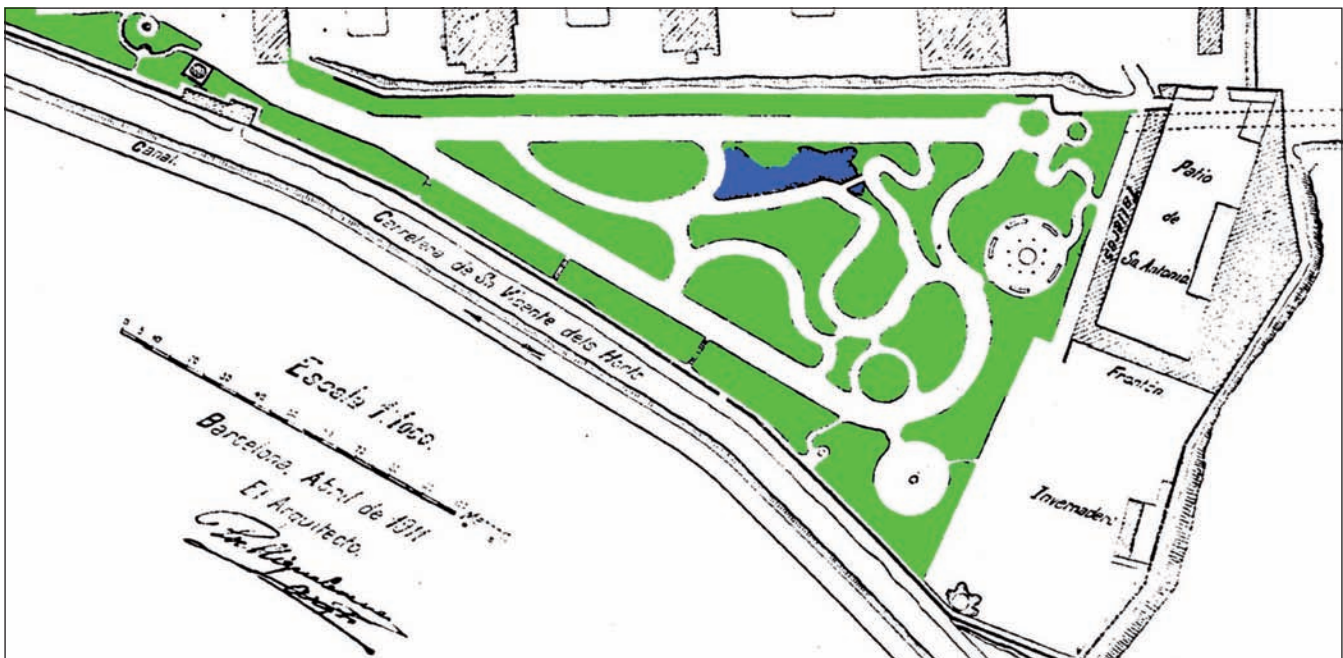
Detail of the garden. This plan coincides with the “Plan completo de nuevas edificaciones y reforma de las existentes. Arquitecto Miquelerena” (Plan of the new buildings and reforms of the existing ones. Architect: Miquelerena), which was approved at the end of 1909, as appeared in the journal *Revista Frenopática Española*. The drawing of the main lake, located at the center of the garden, belongs to a plan created before 1906 [1].
